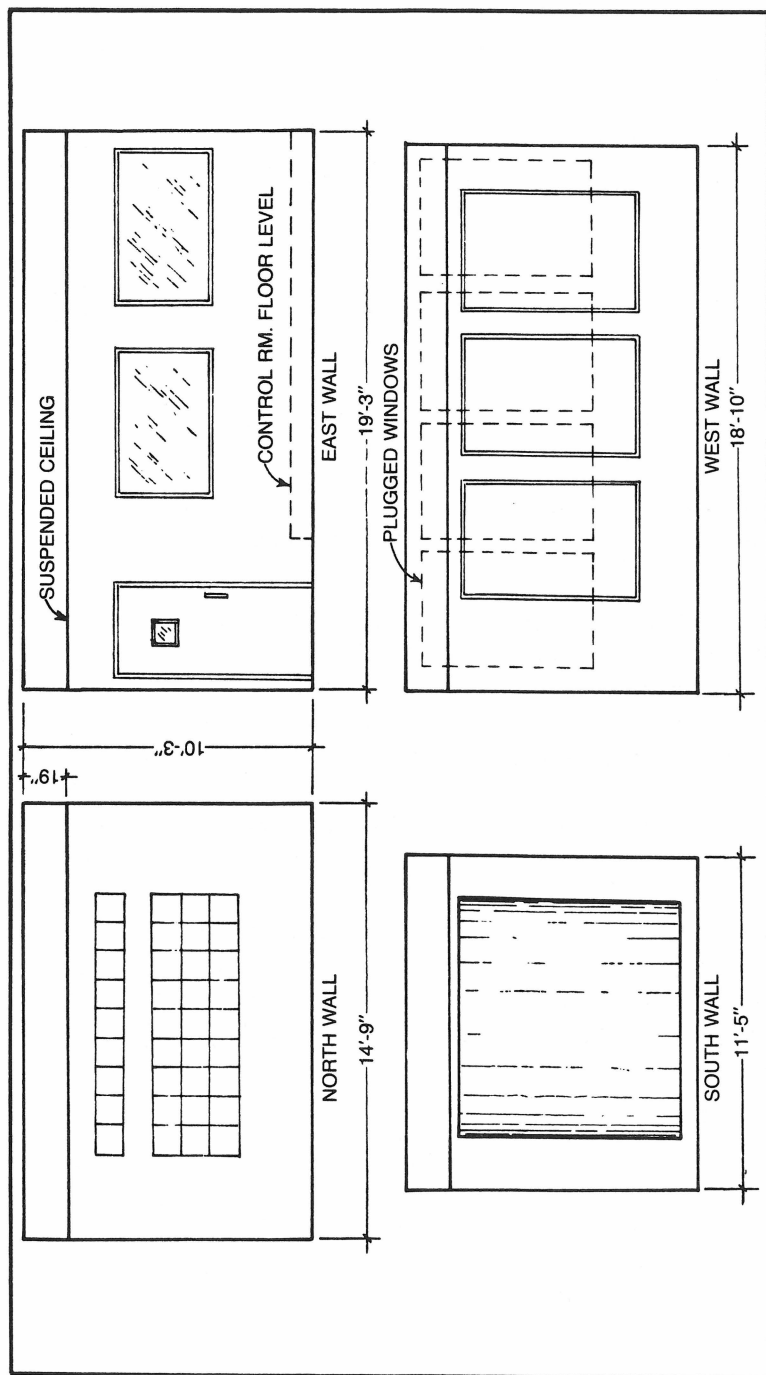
Placement plan for acoustical elements on four walls of studio.
